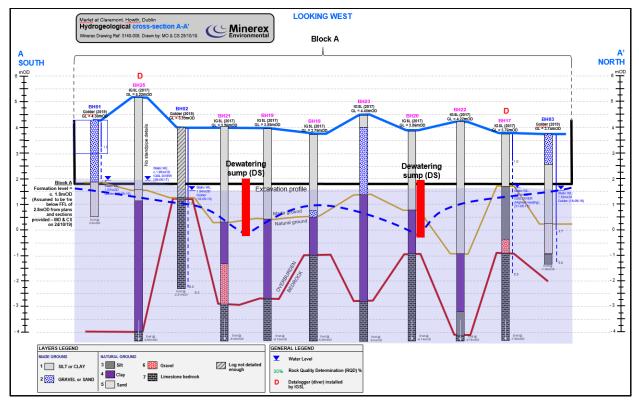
Section A-A – Ref to Figure 12.2.14
